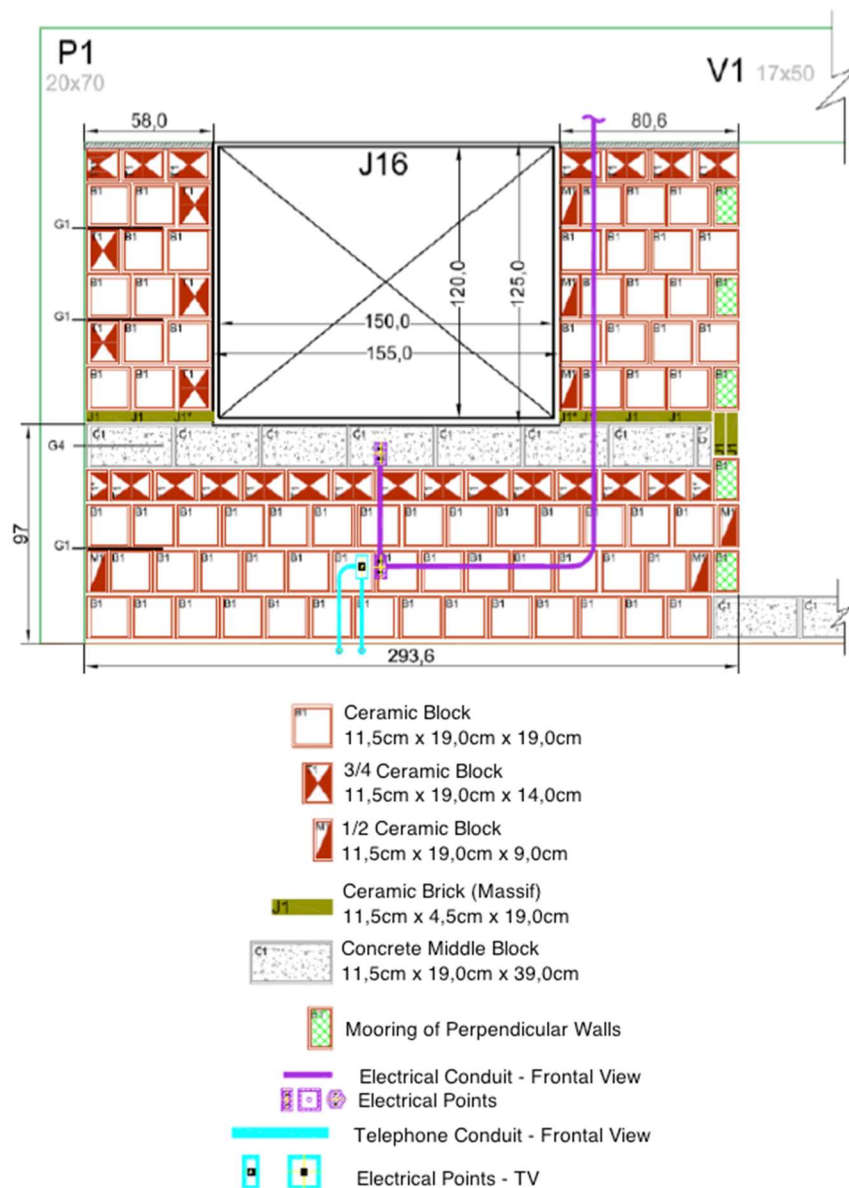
Masonry-labor project of studied floors (source: the authors)
